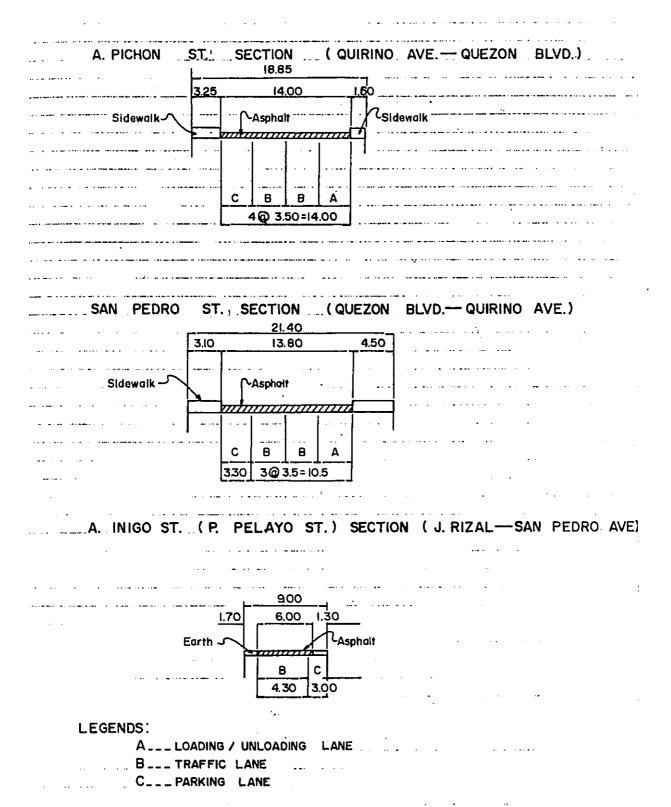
CROSS SECTION OF ONE-WAY ROAD AND UTILIZATION OF ITS ROADWAY
